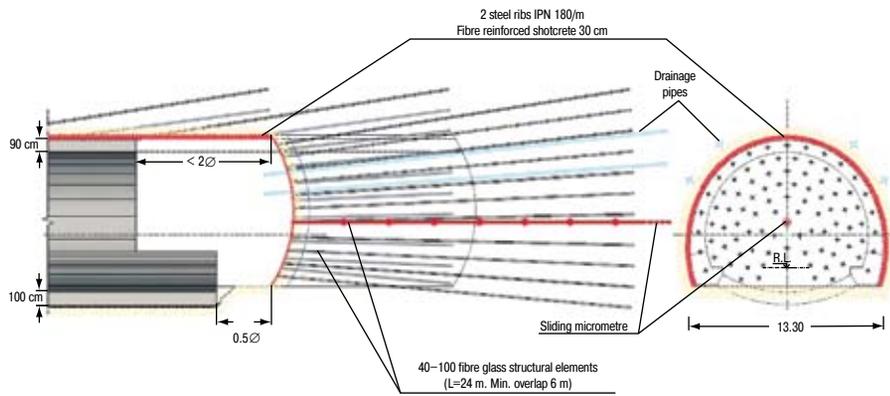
High speed rail line between Bologna and Florence – Section type used for excavation of the “Raticosa” tunnel
